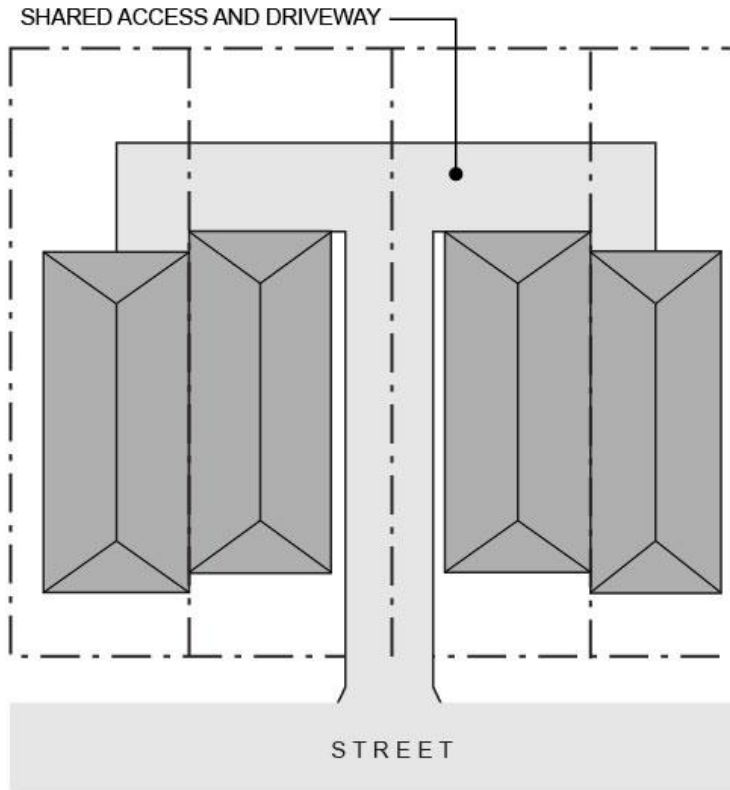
N. Townhouses on Corner Lot with Shared Access
